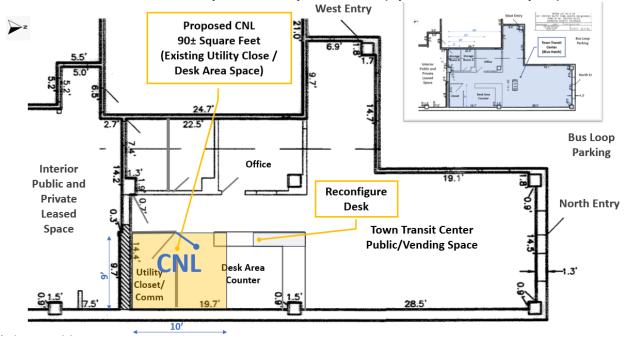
Town Transit Center Proposed CNL – Space Location (Option A – Minimal Space) West Entry Proposed CNL 90± Square Feet (Existing Storage Space) Bus Loop Parking Interior Public and Private North Entry Leased Space Town Transit Center Public/Vending Space Desk Area Utility Counter Closet/
